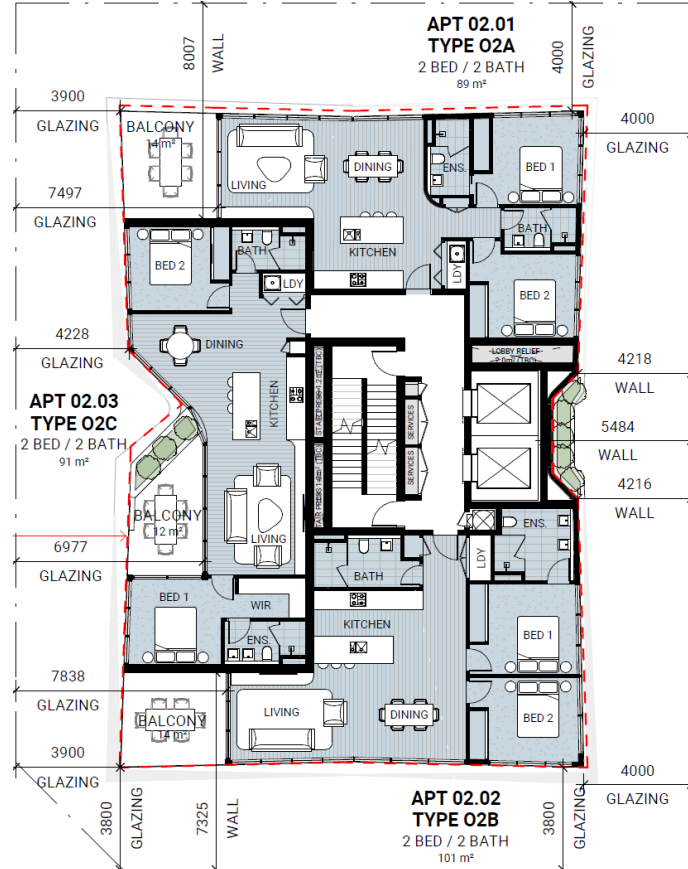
Proposed Level 2-6 Floor Plan (Source: Plus Architecture)
